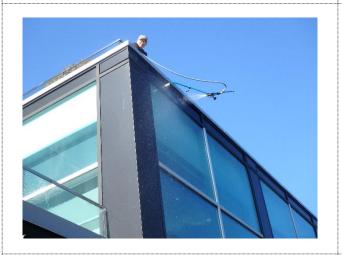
Water testing the active water ingress at the 2nd floor kitchen celling.
